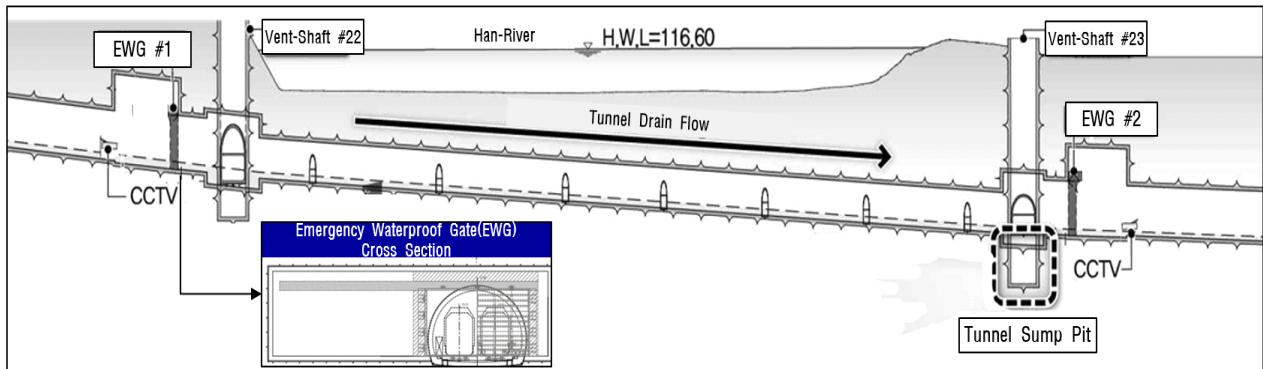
Cross-Section of Tunnel Emergency Waterproof Gate(EWG) Installation in GTX-A Line
